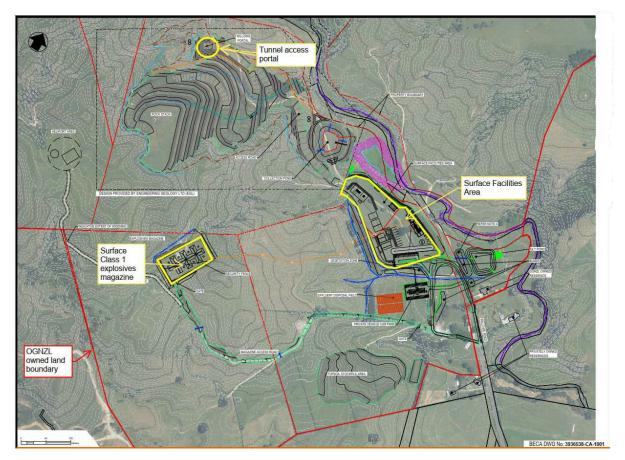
Layout of Willows Rd portal entrance site highlighting key areas Source: BECA WAI-981-000-DWG-CI-1001 Rev O
